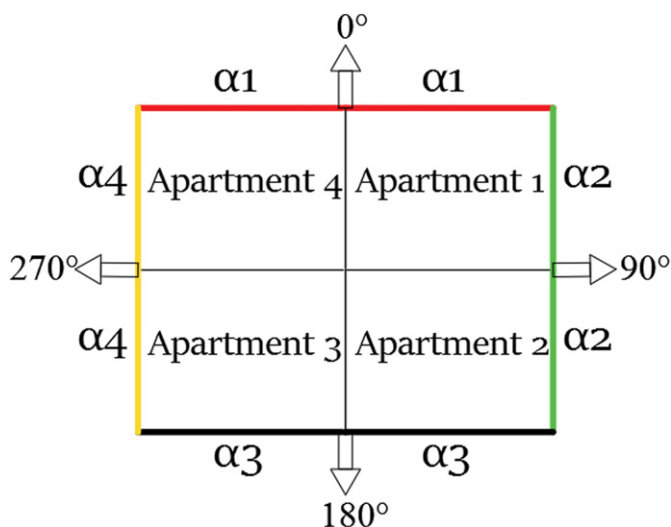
A typical floor plan in the case of cardinal directions for a high-rise residential building that has four double façades apartments per floor.
